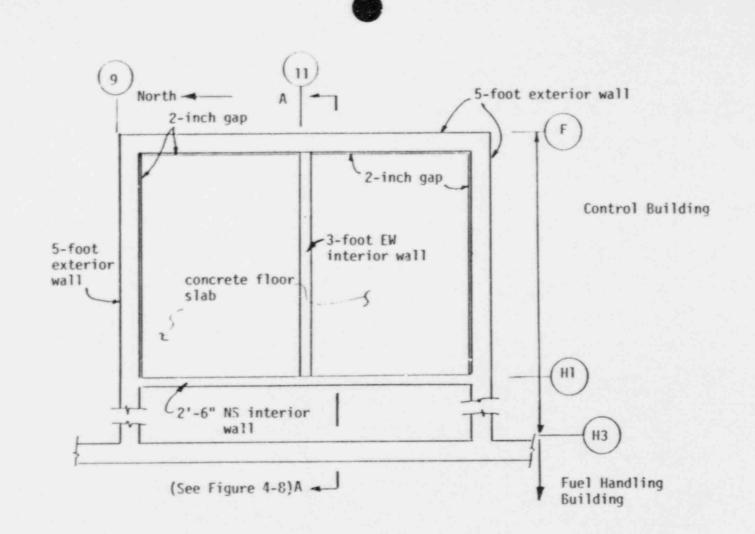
CONTROL BUILDING TYPICAL FLOOR PLAN
